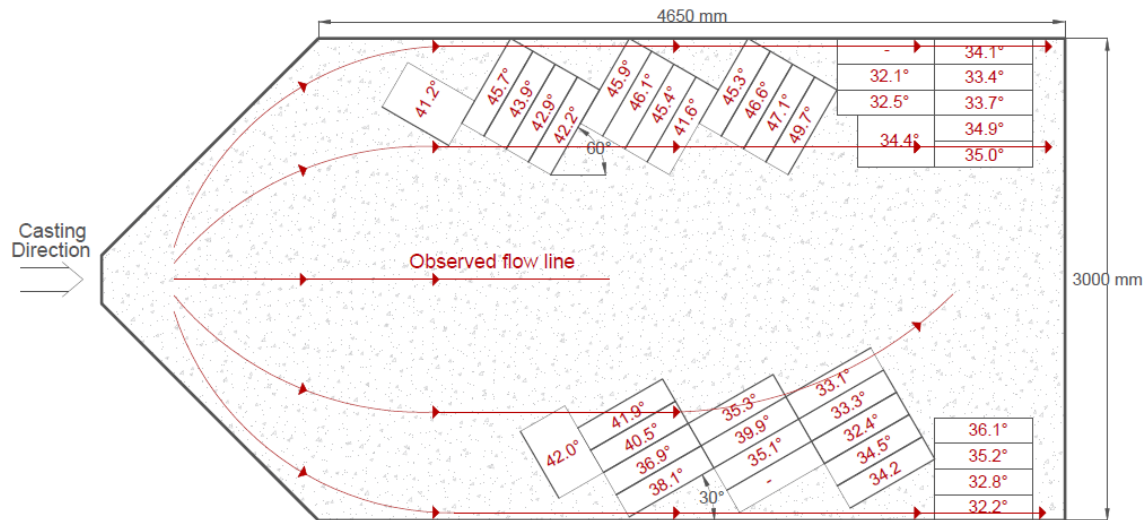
Slab plan view, observed concrete flow lines and mean fiber angle (θ)
